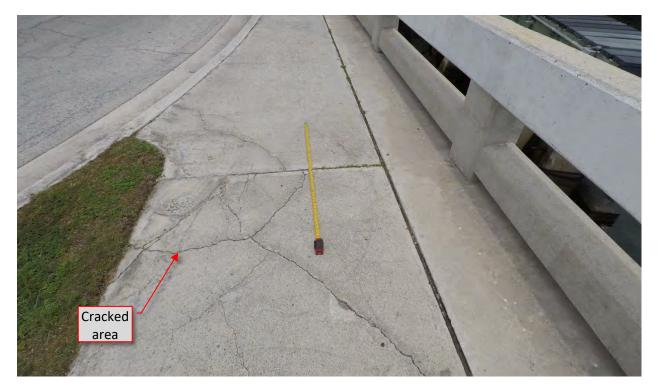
STA 6+50 - 6+60. Cracks in concrete slab to sidewalk.
